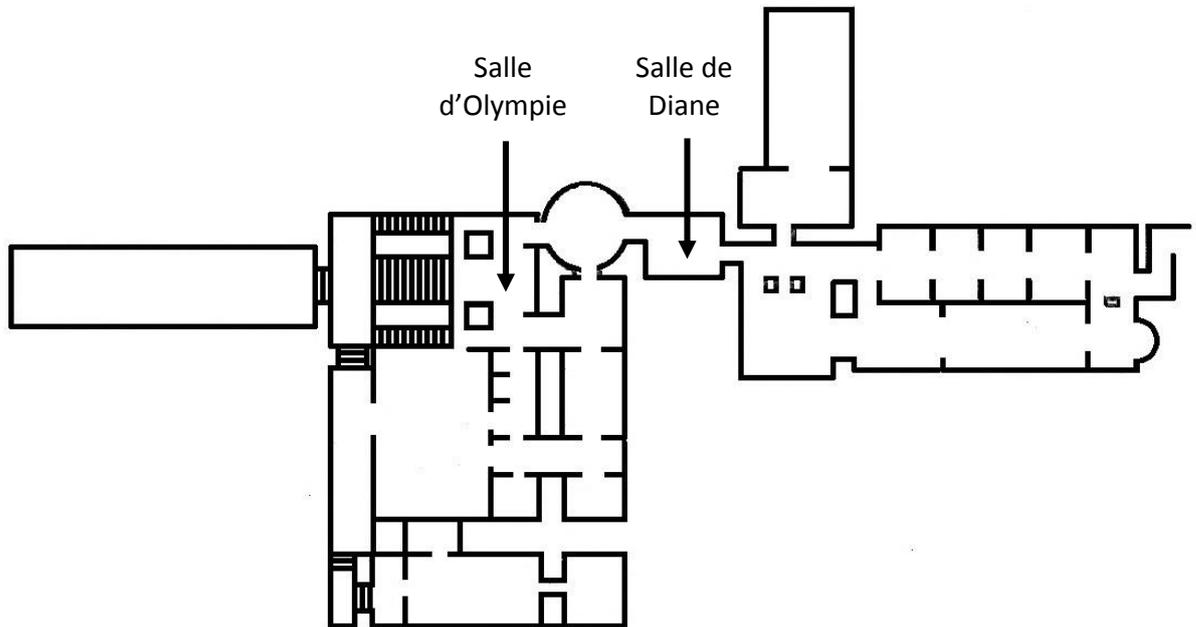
Floor plan of the Greek, Etruscan and Roman Antiquities department, Musée du Louvre. Image author's own
